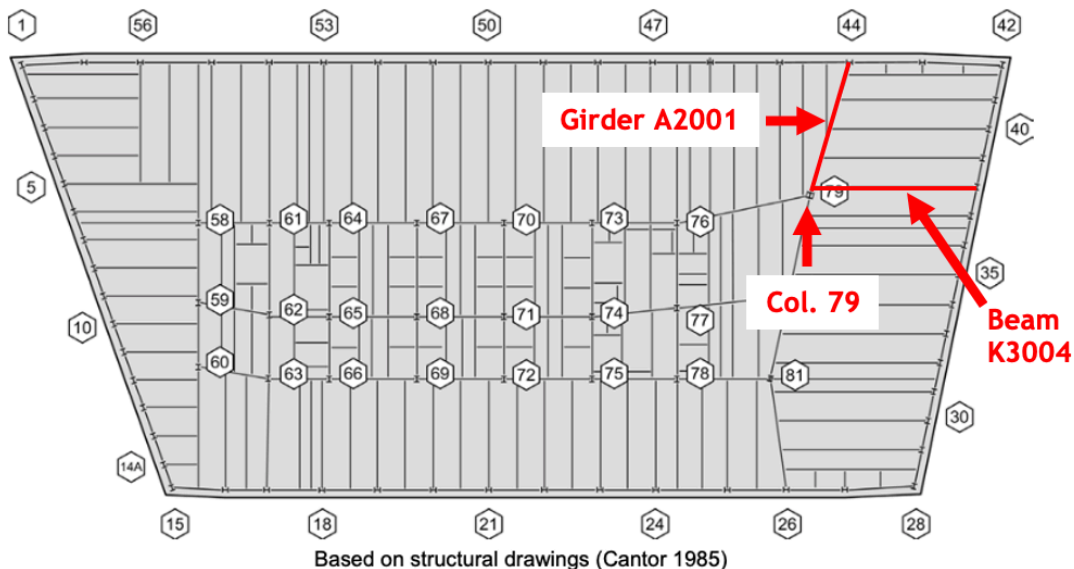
Typical WTC 7 floor showing locations of the columns, girders, and beams.
